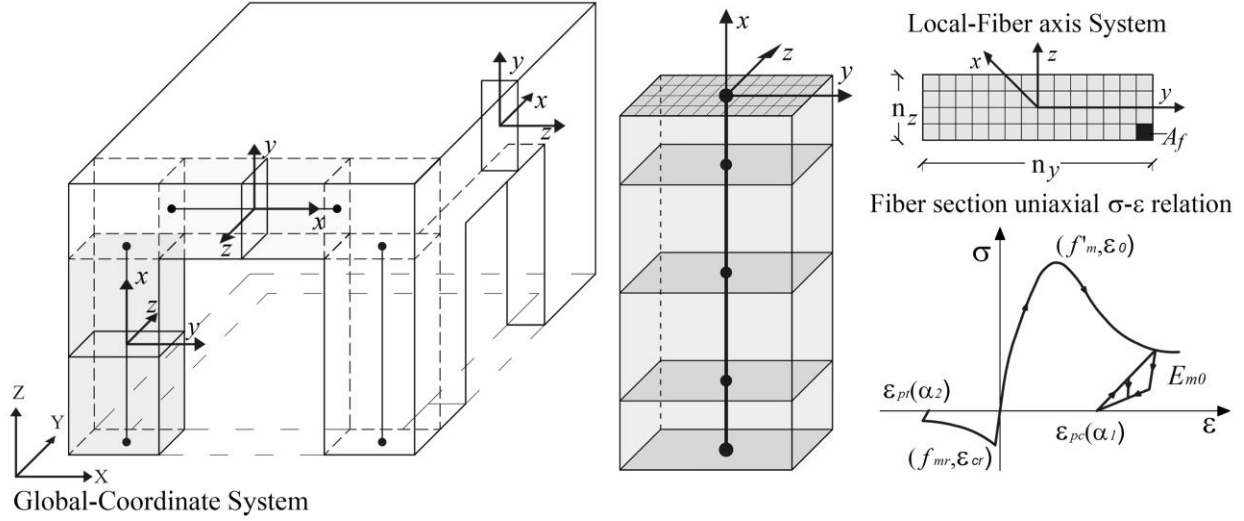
Forced-based, fiber-section elements (for masonry piers and spandrels) in the 3D global system; distribution of Gauss-Lobatto points, section subdivision into fibers and fiber nonlinear stress-strain law.
